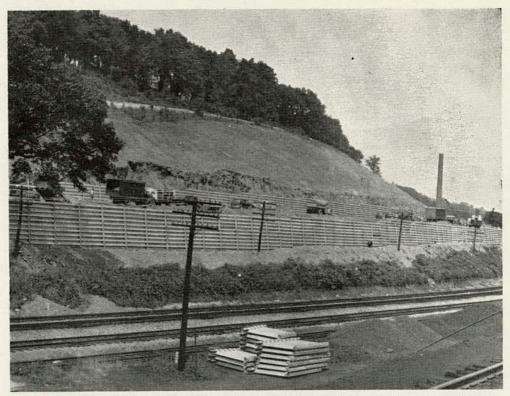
Metal cribbing used as retaining walls above highway and between highway and railroad at Binghamton, N. Y. (Photograph courtesy of Armco Drainage and Metal Products, Inc.)
